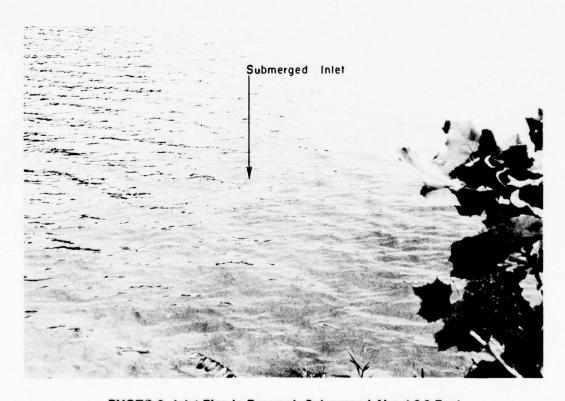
Inlet Pipe in Reservoir Submerged About 0.9 Foot
